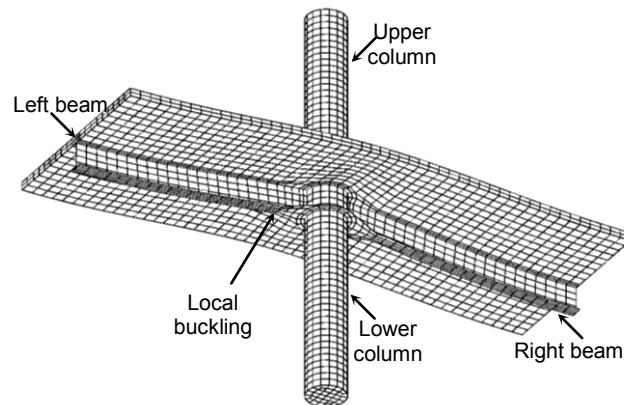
Failure appearance of the CFST column to restrained steel beam joint
